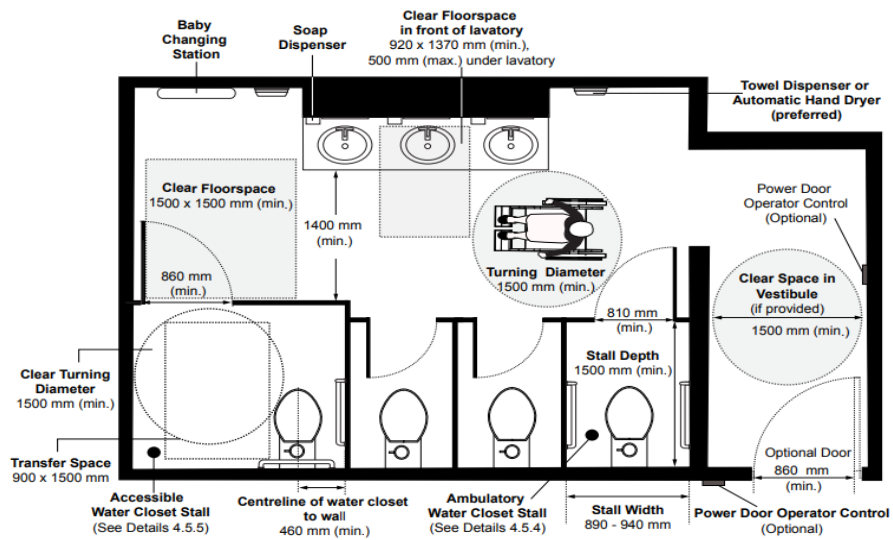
Example of Multiple Occupancy Washroom Layout [4]
